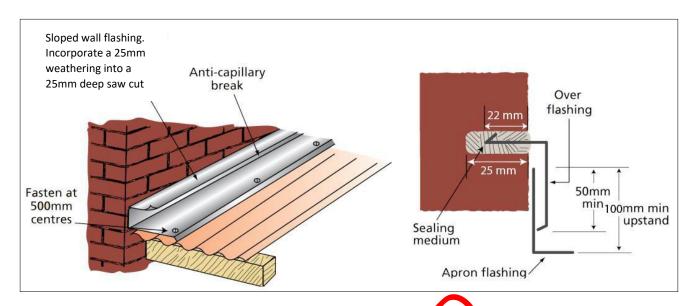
Wall and Step Flashings, referenced from HB 39 Figure 8.4(B)
